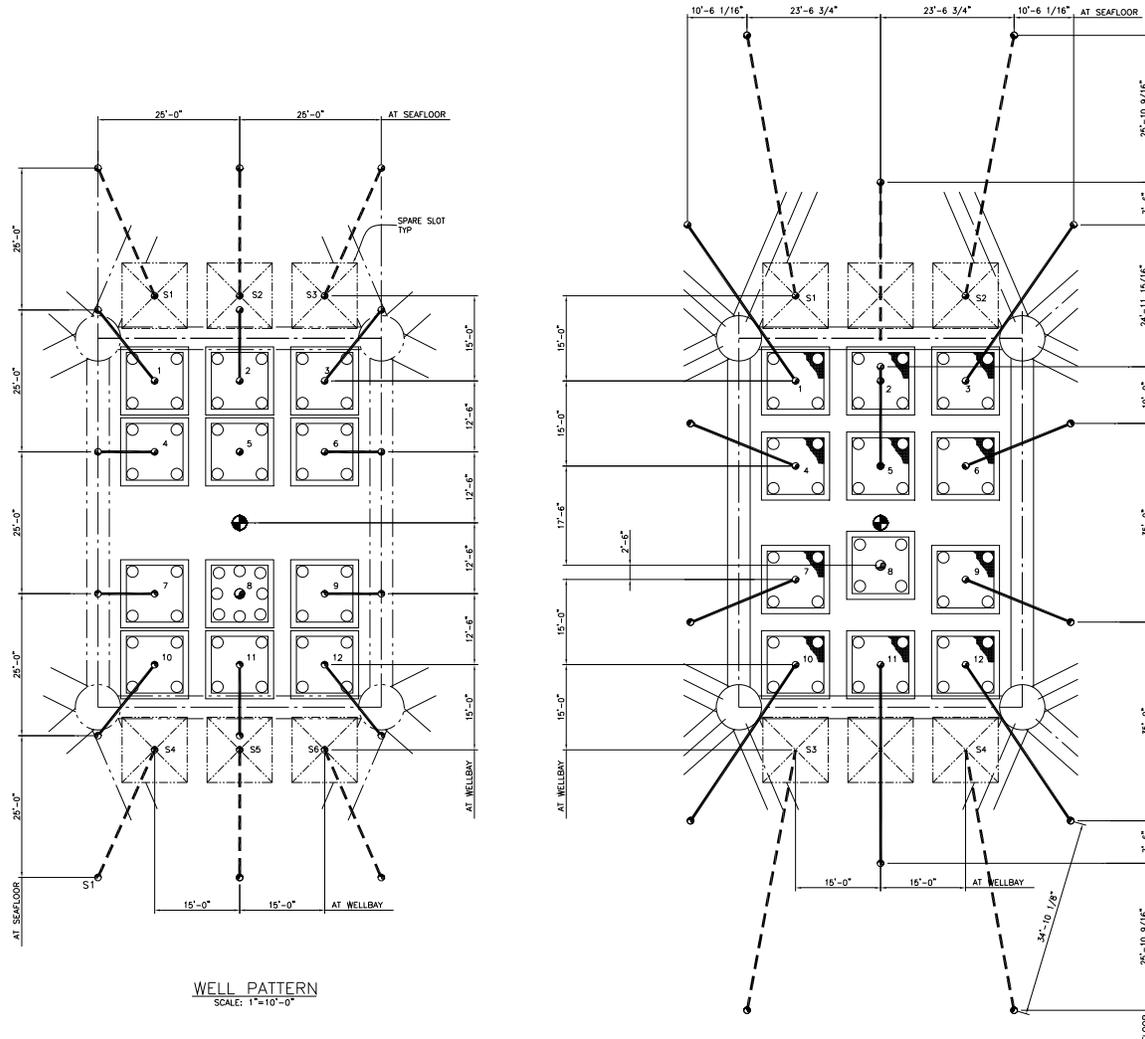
Well Pattern at Wellbay and Seafloor
